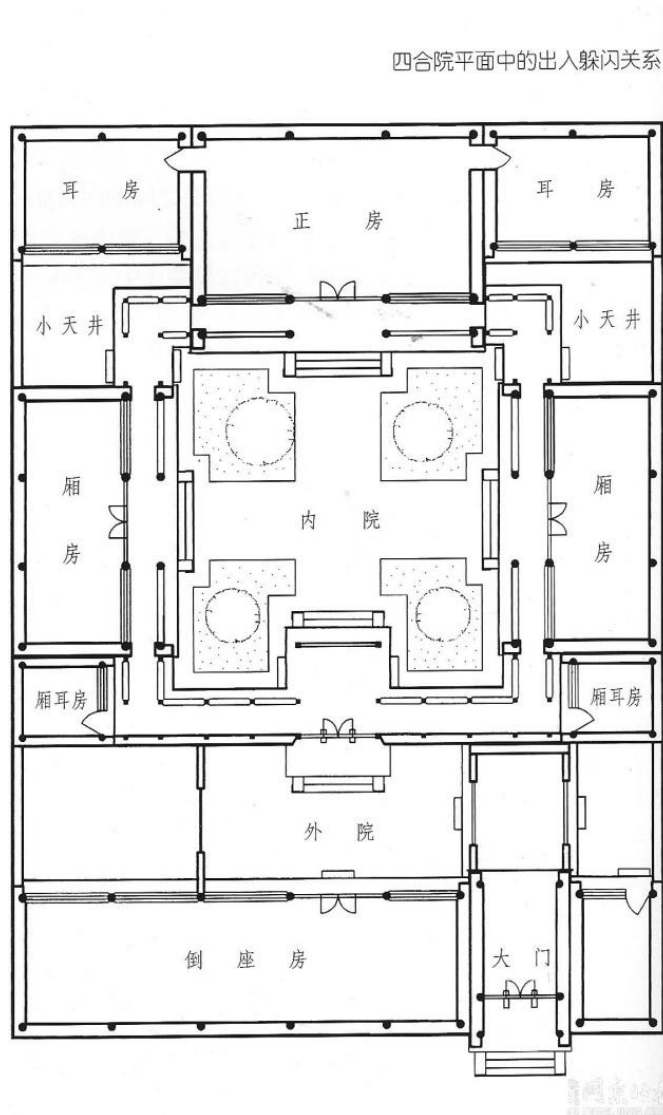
Small Type of Siheyuan (Siheyuan Floor Plan 1, 2009)
